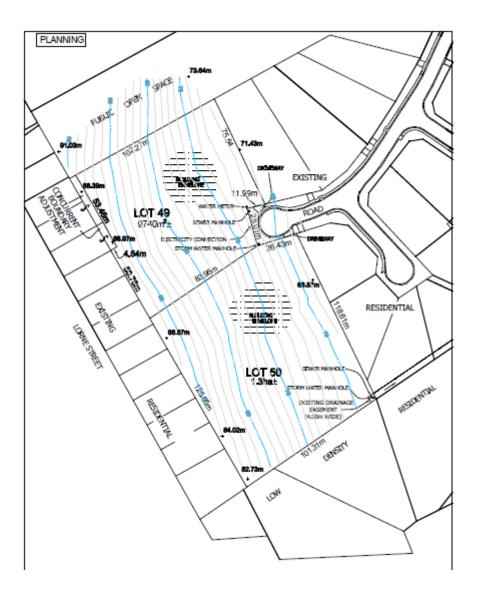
Source - Woolcott Surveys - proposed subdivision layout - Technopark, Launceston
